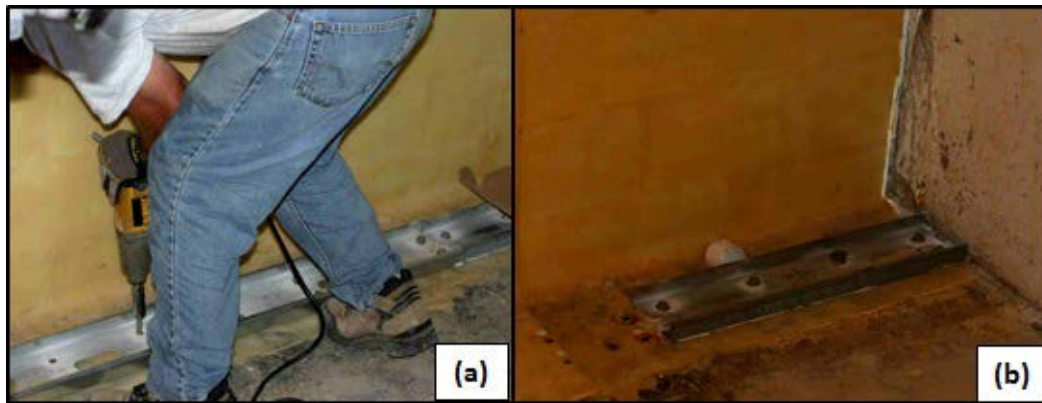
Anchor installation. (a) Concrete bolts installed with impact wrench. (b) One of three pieces of the steel studs used to anchor bottom support.
